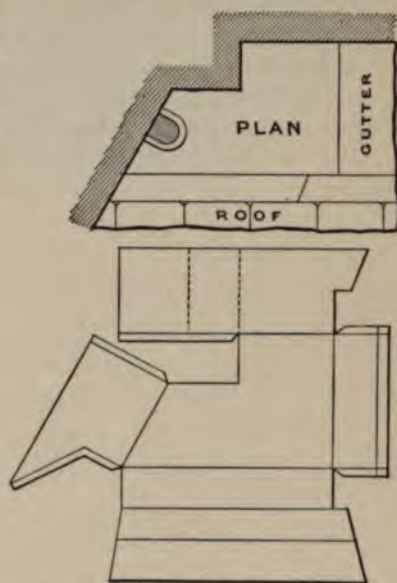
Plan of Cesspool with "Break", and Method of Cutting the Lead
